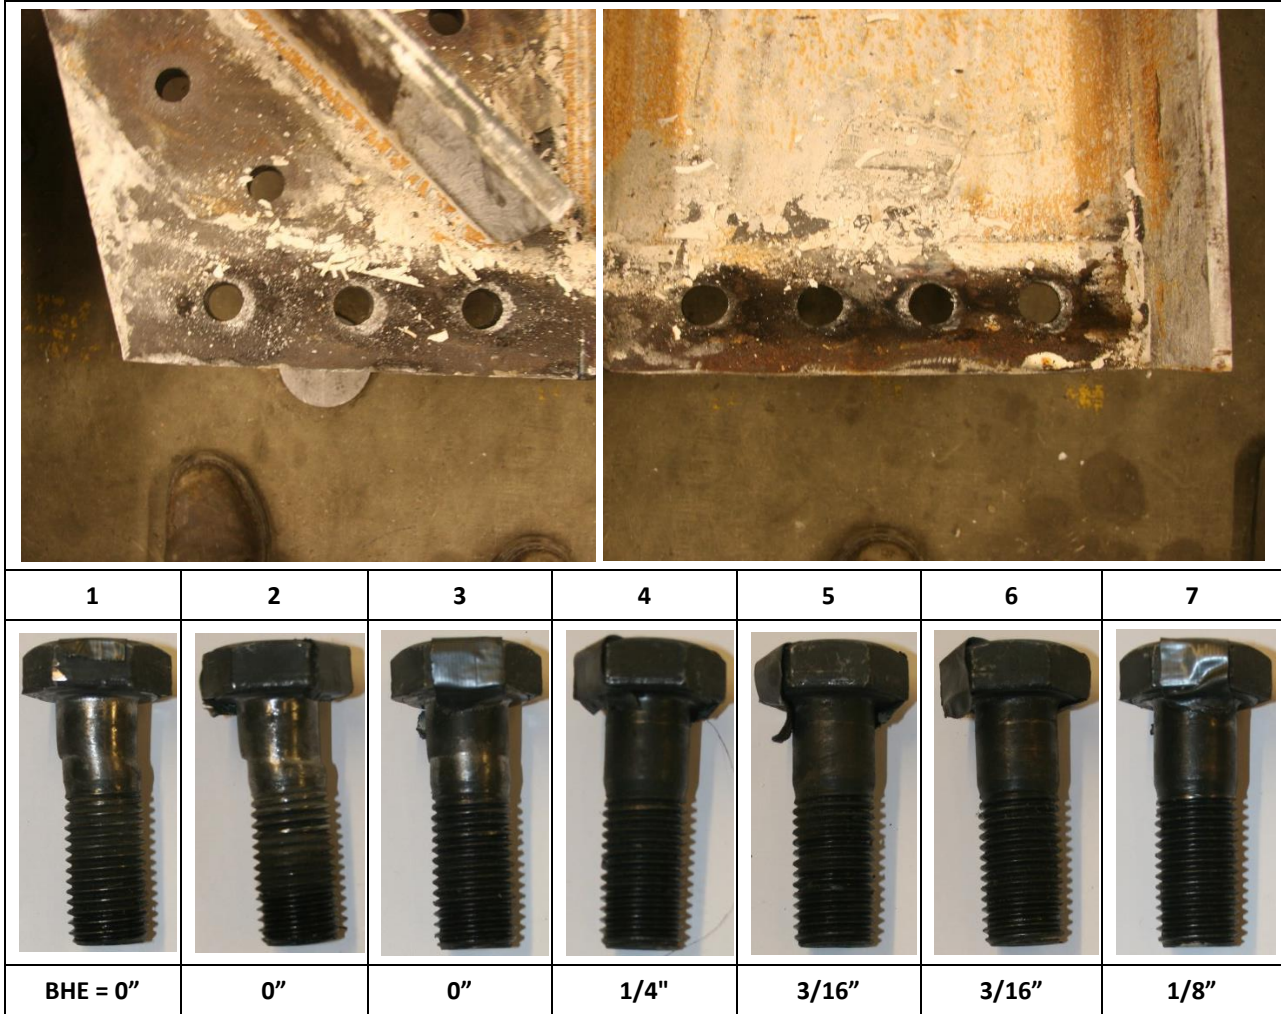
Bolt Hole Elongation and Bolt Damage in SW Connection
